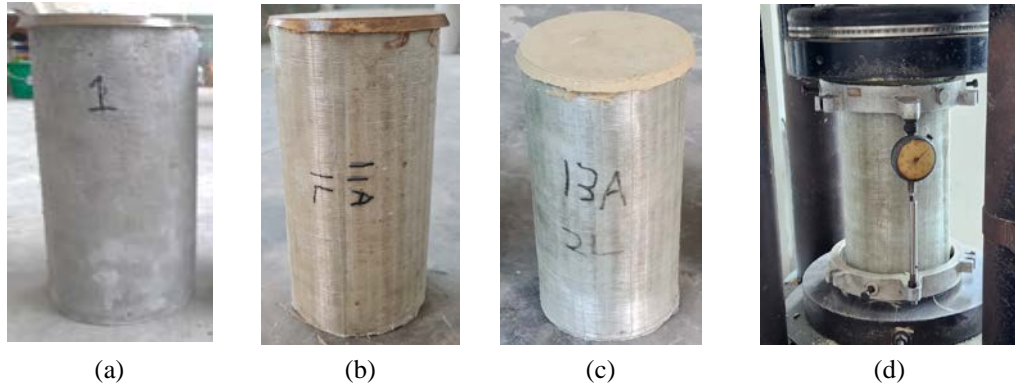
Concrete cylinder sample of specimens: (a) unconfined, (b) single wrap, (c) double wrap and (d) instrumentation set up during compression test.
